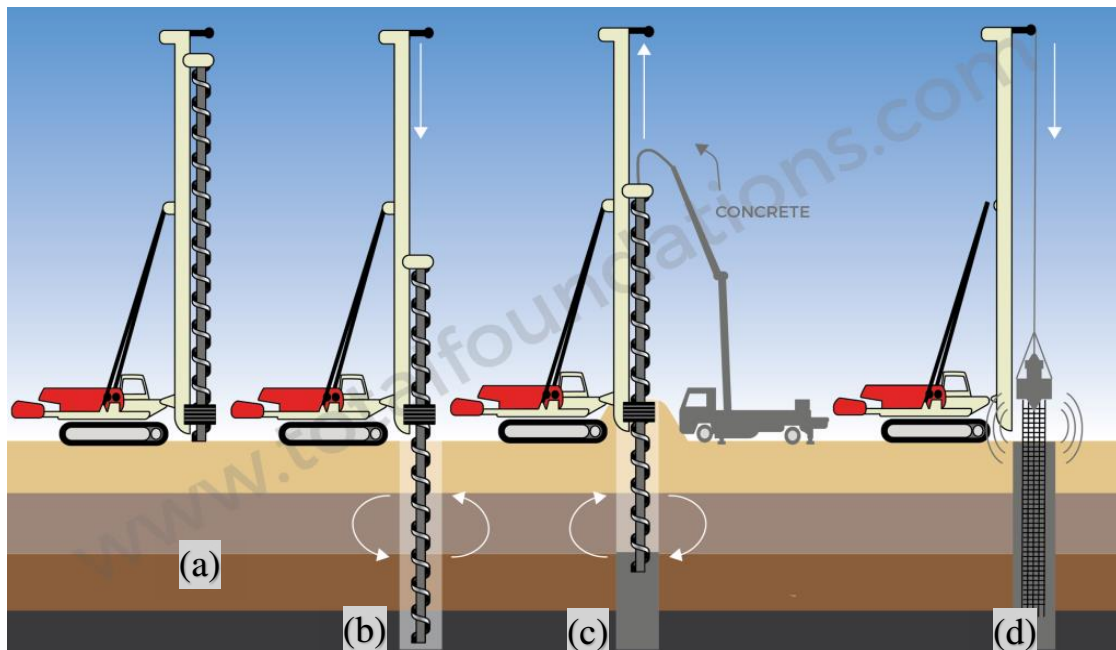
Installation of CFA Augar Piles step by step, (a) set-up CFA, (b) drilling, CFA drilling, (c) pouring concrete while recovering augar, and (d) insertion of steel reinforcement with vibration [2]
